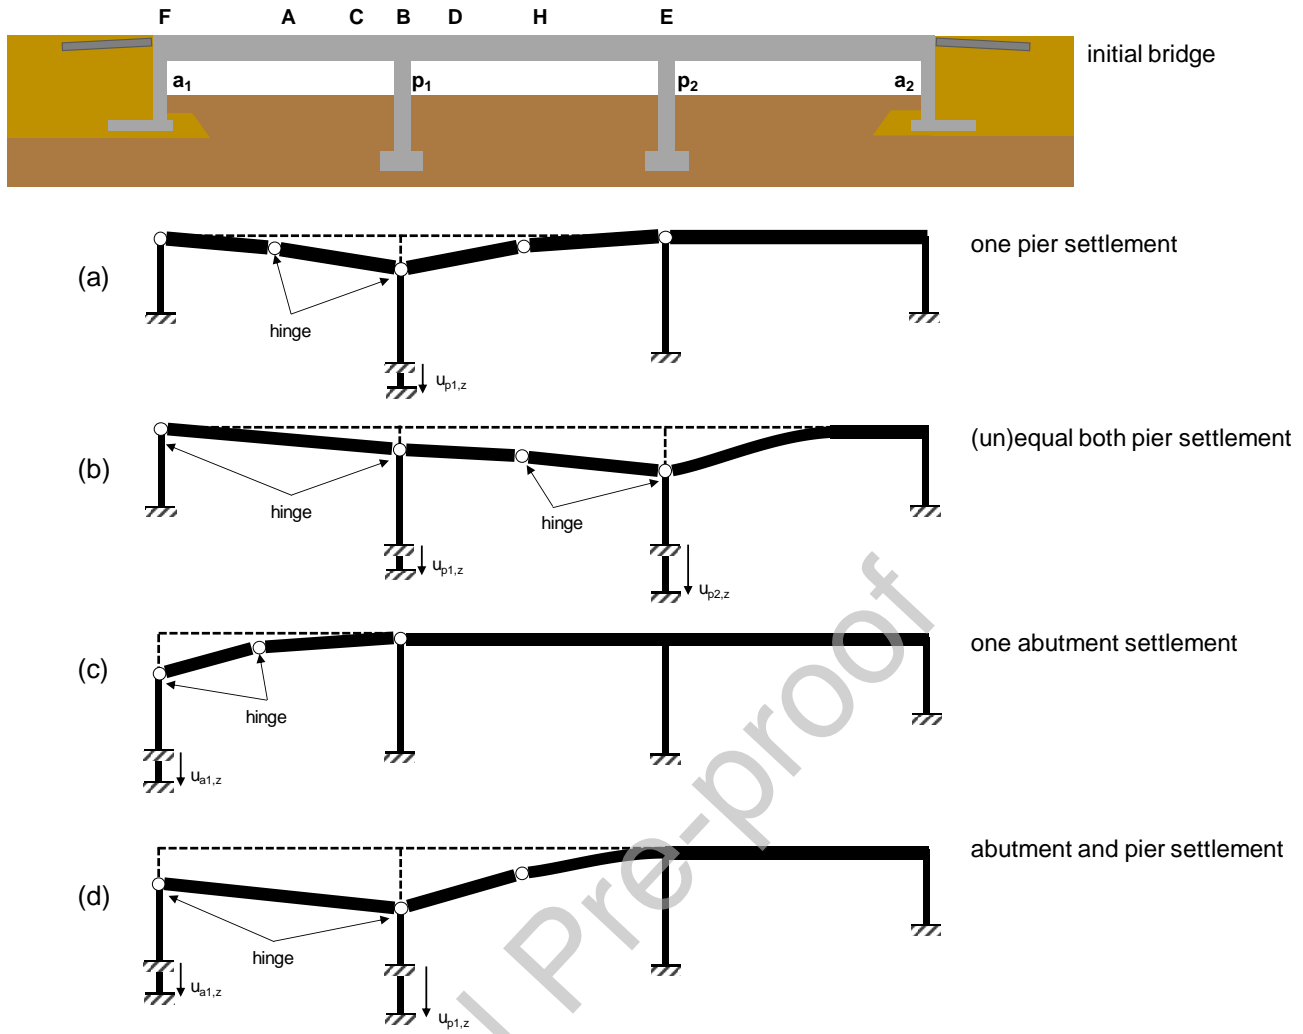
Sketches of potential failure mechanisms for scour-induced damage of bridges with continuous deck and/or integral piers (p) and abutments (a).
